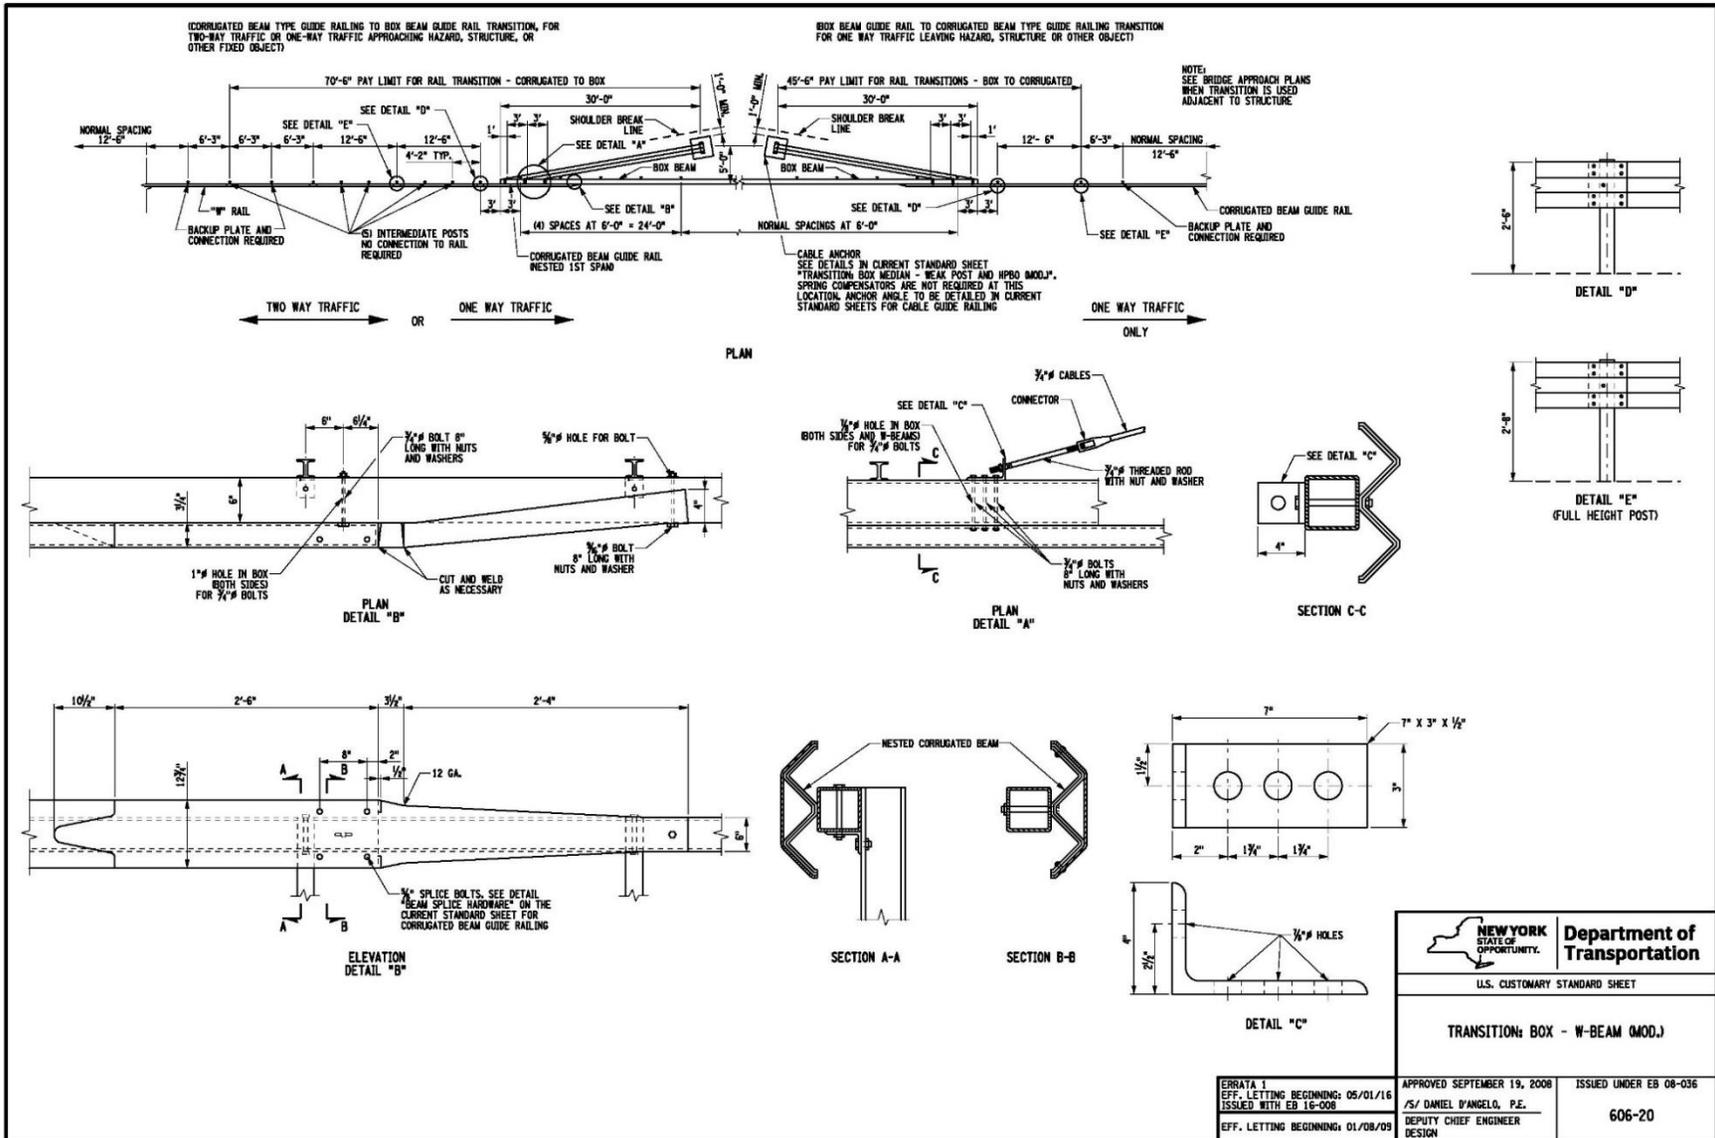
New York Standard Sheet for Box Beam to Weak-Post W-Beam Transition, Test No. NYBWT-2 [15]
